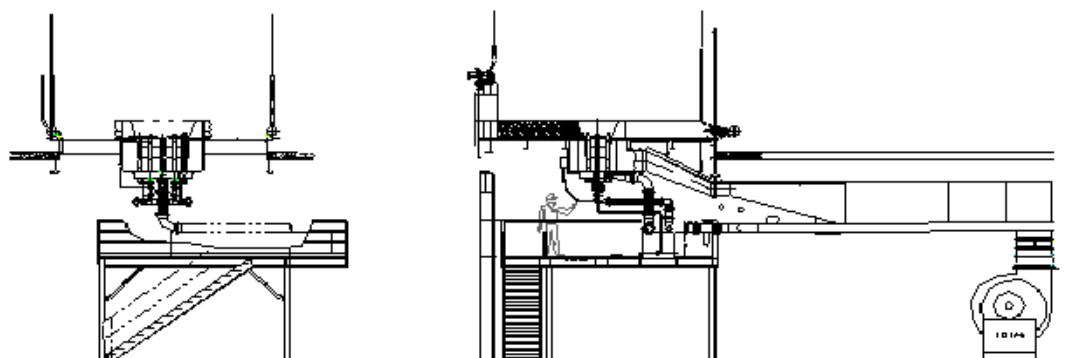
Stoker Boiler Conversion to Gas Using a Single Burner
